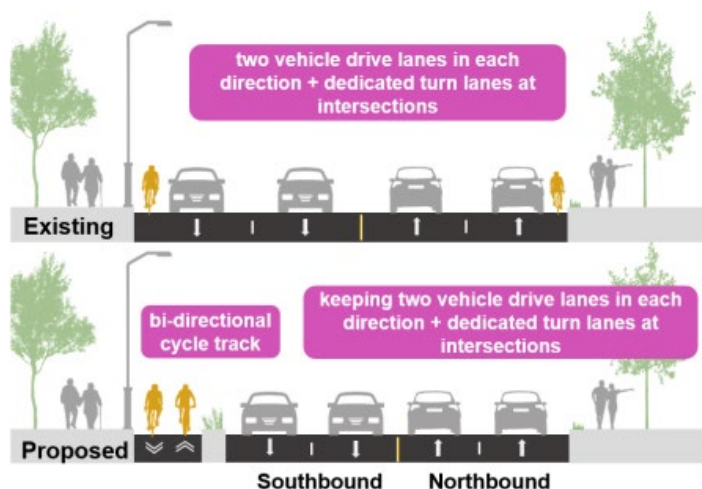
Existing and Proposed Cross-Section on Trethewey Drive
